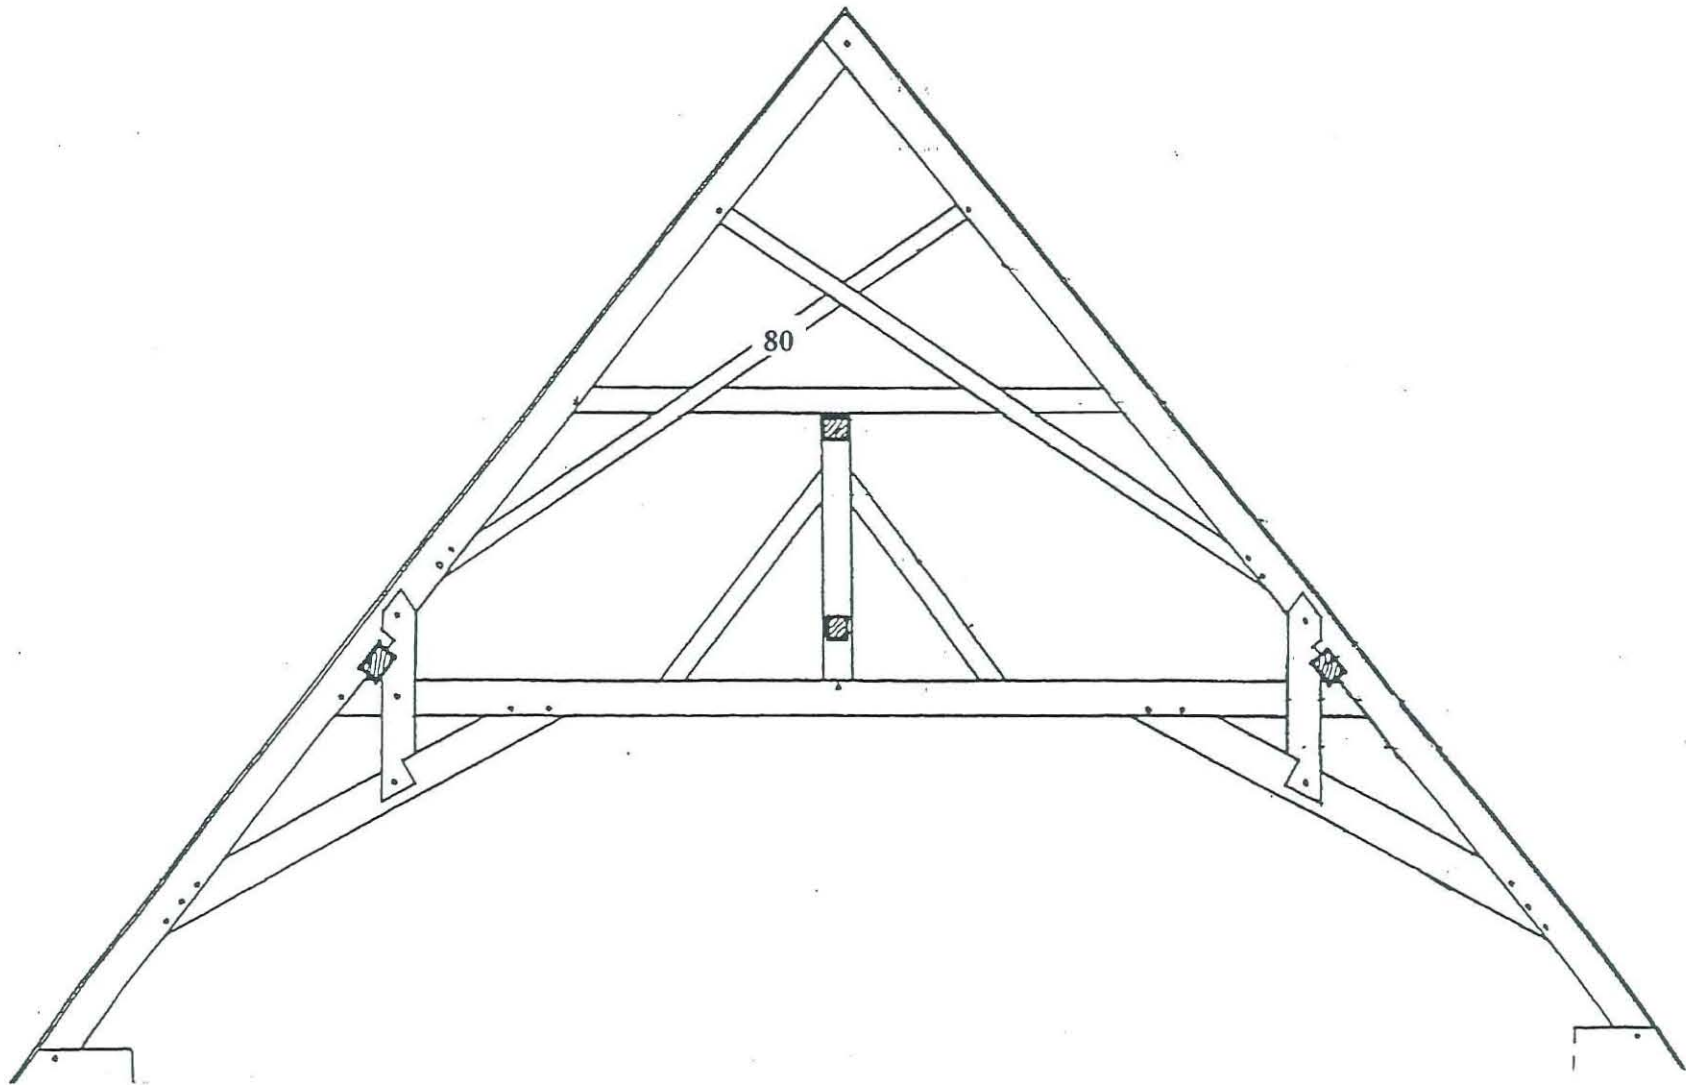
Drawing of frame 69 of the Choir and crossing, viewed from the east, to show sample locations
